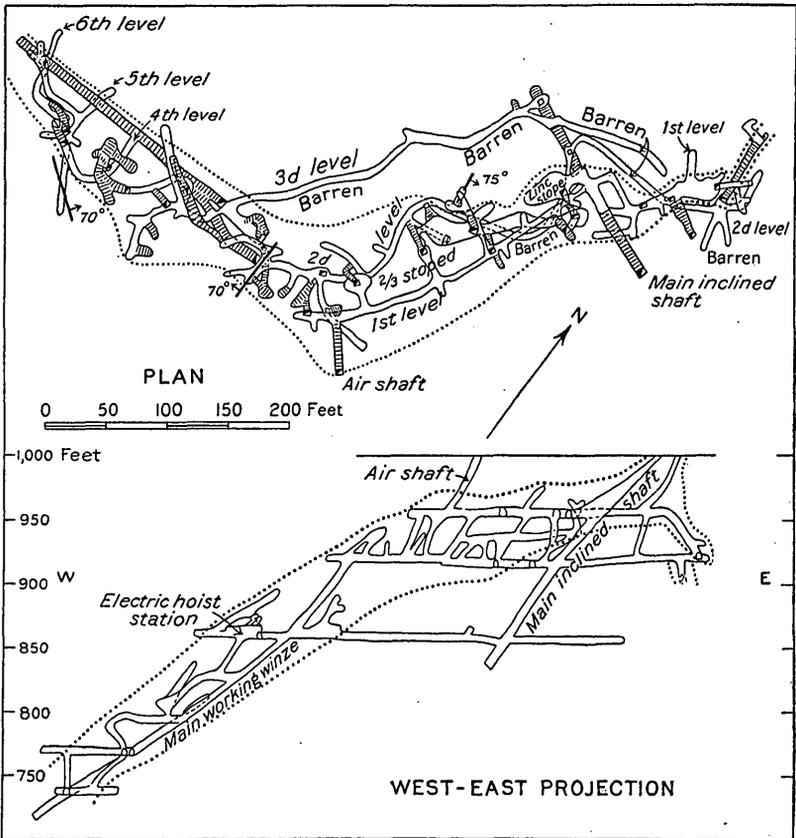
Plan and elevation of the workings of the Bybee mine, Clark County, Nev.
